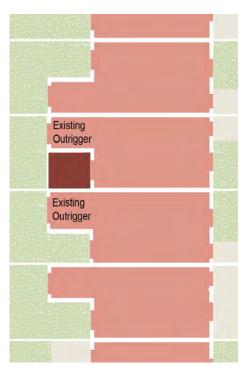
Example of where a twostorey rear extension may be acceptable where it would be infilling between existing extensions / outriggers and would not impact on neighbouring amenity.
